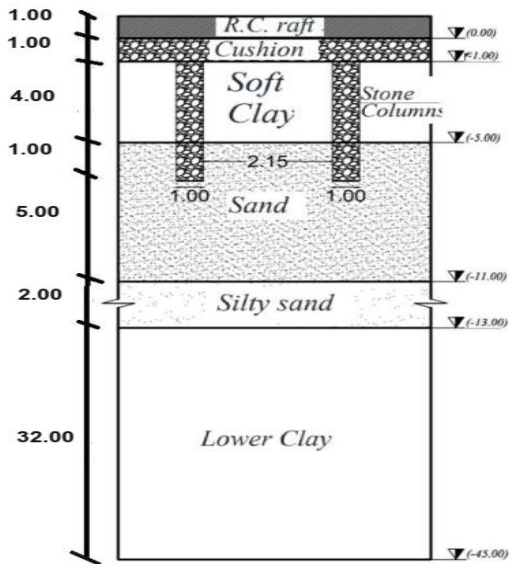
Soil Profile of Stone column with soil layers with dimensions in meters
